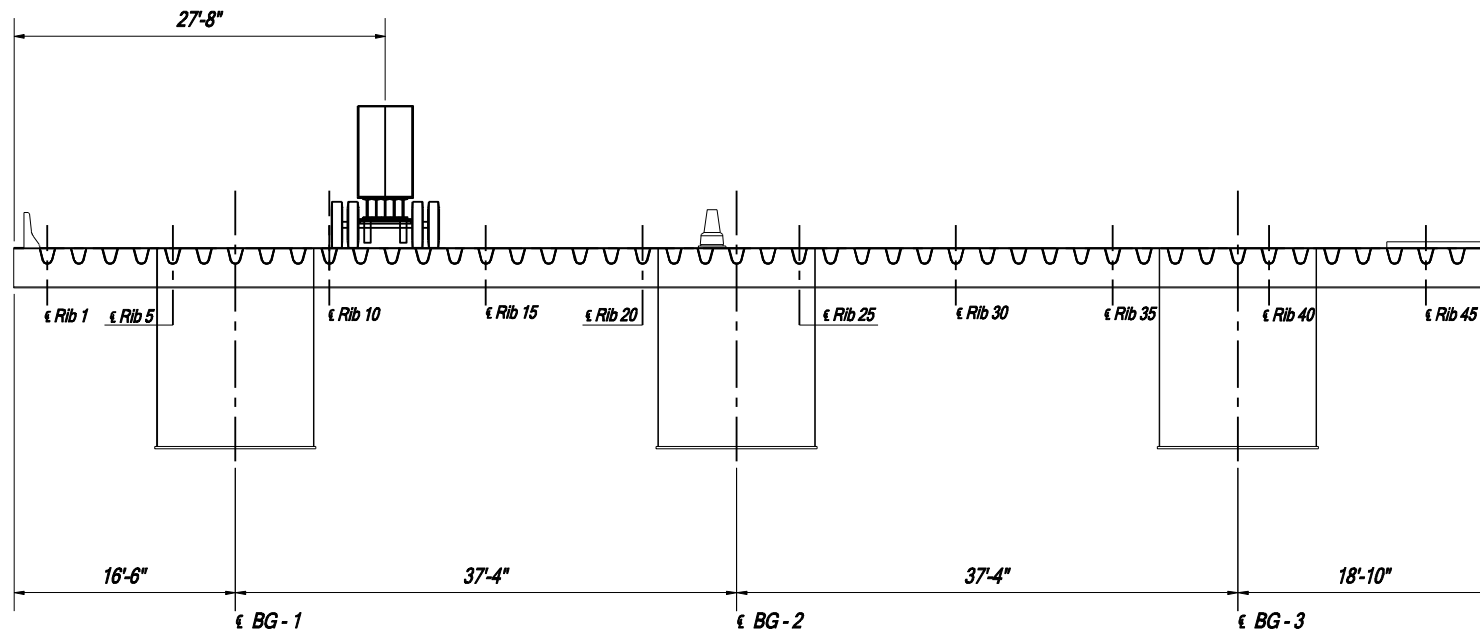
Transverse load position T29 considered for FEA of bridge deck
